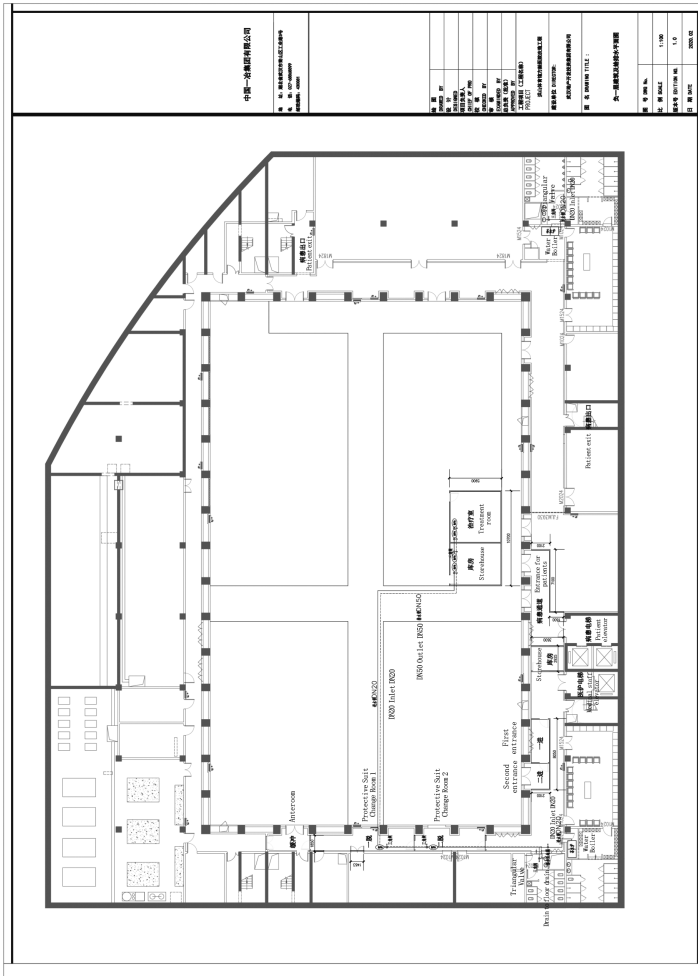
Building, Water Supply and Drainage Plan of Wuchang Fanggang Shelter Hospital Basement 1
